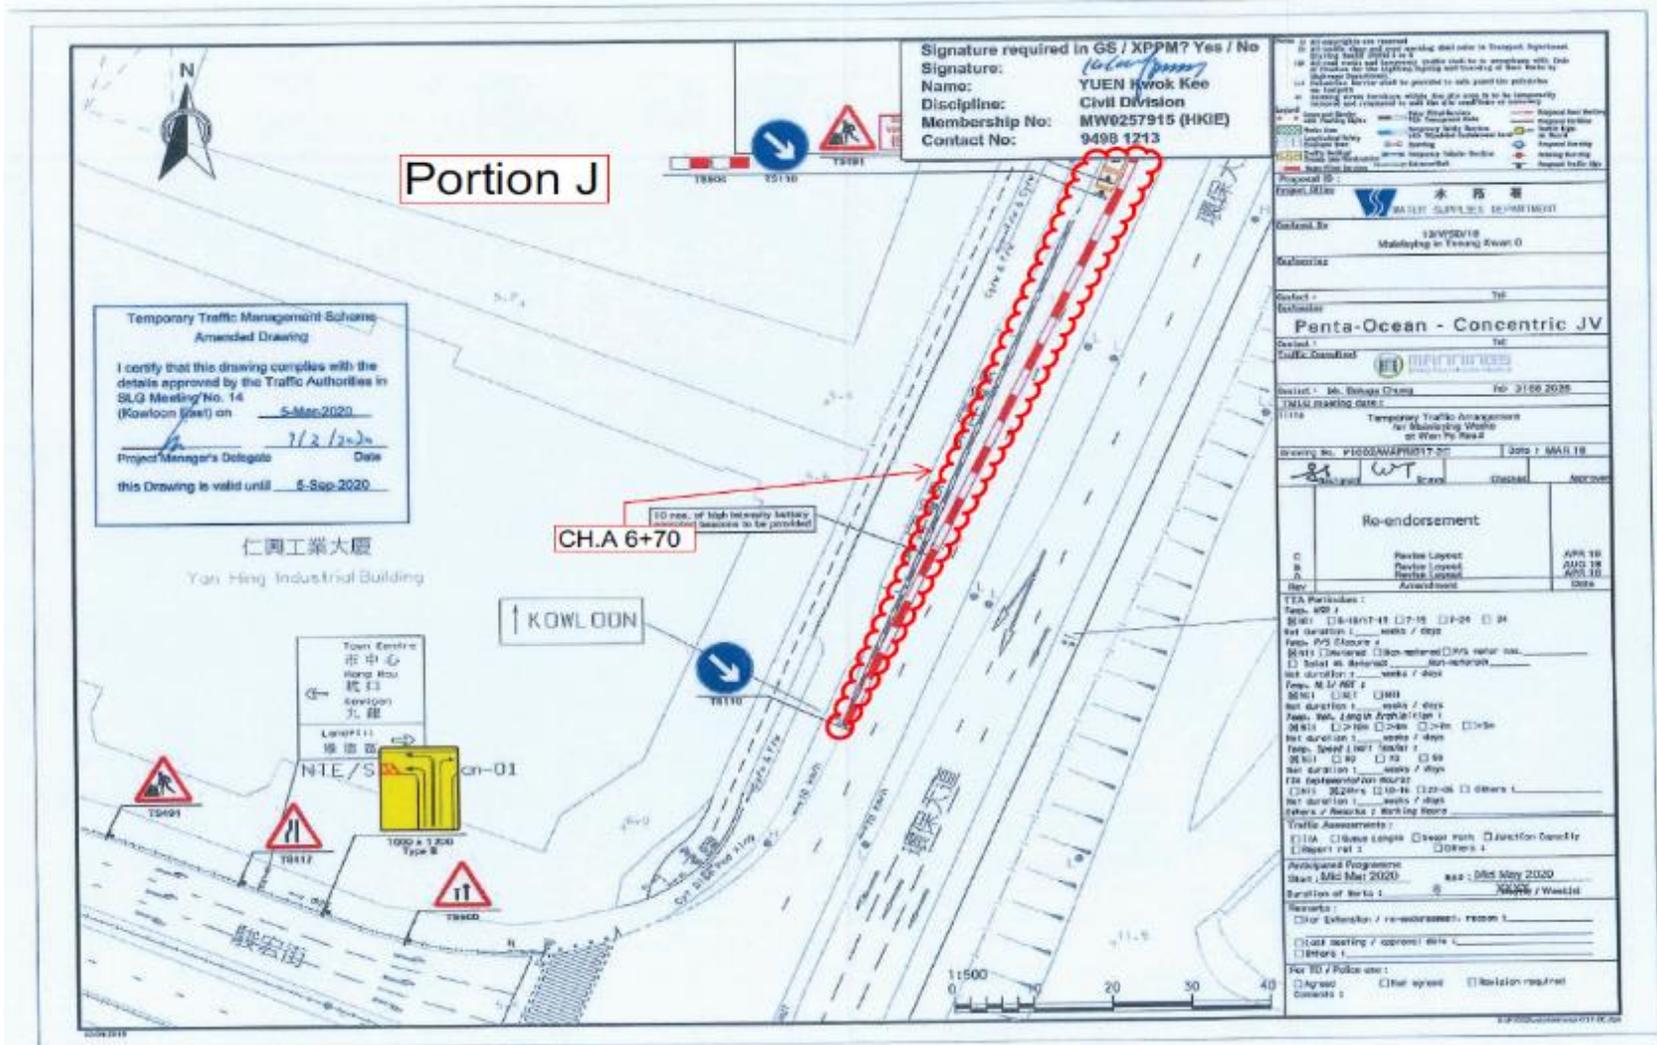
(ii). Location Plan for Portion J - CH.A 6+70
